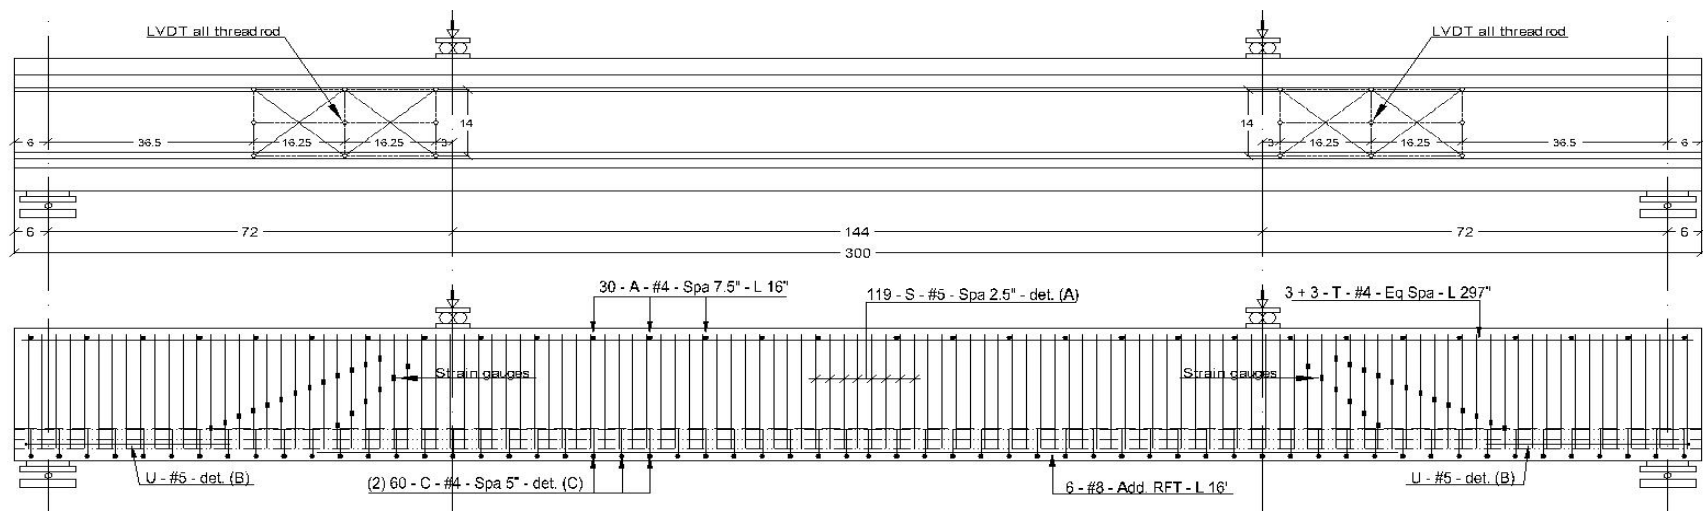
Detailed Longitudinal Cross-Section for Girder C3
